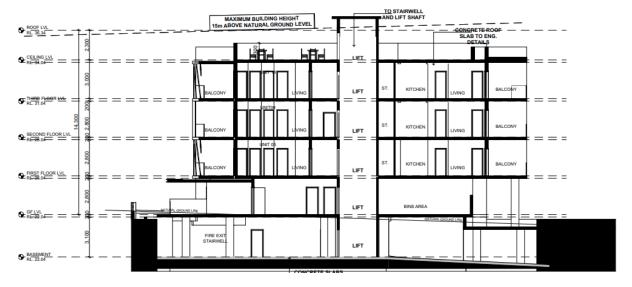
Section plan showing extent of height variation sought. Source: Archi-Build International
